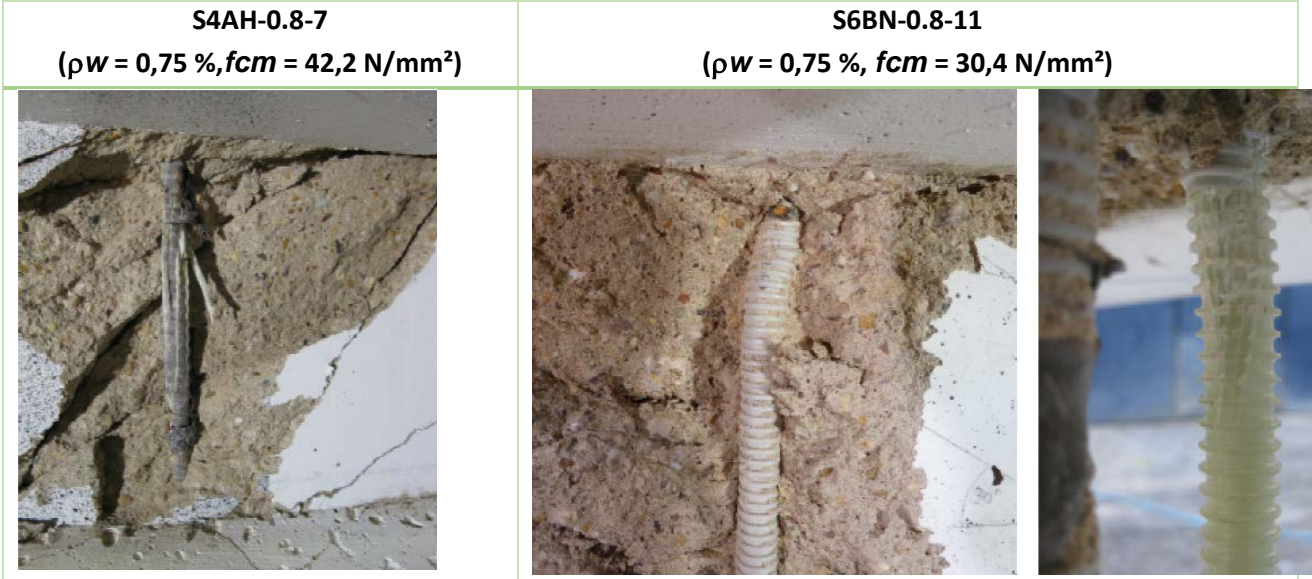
Damaged stirrups (Type A and B) after failure in experiments with a shear reinforcement degrees ρ_w of 0.75% (Kurth 2012)
